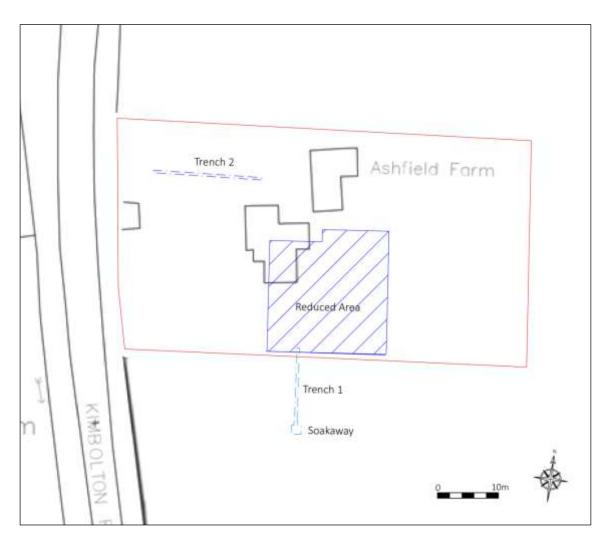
Trench 1, Trench 2, soakaway and reduced area plan (scale 1:500)
